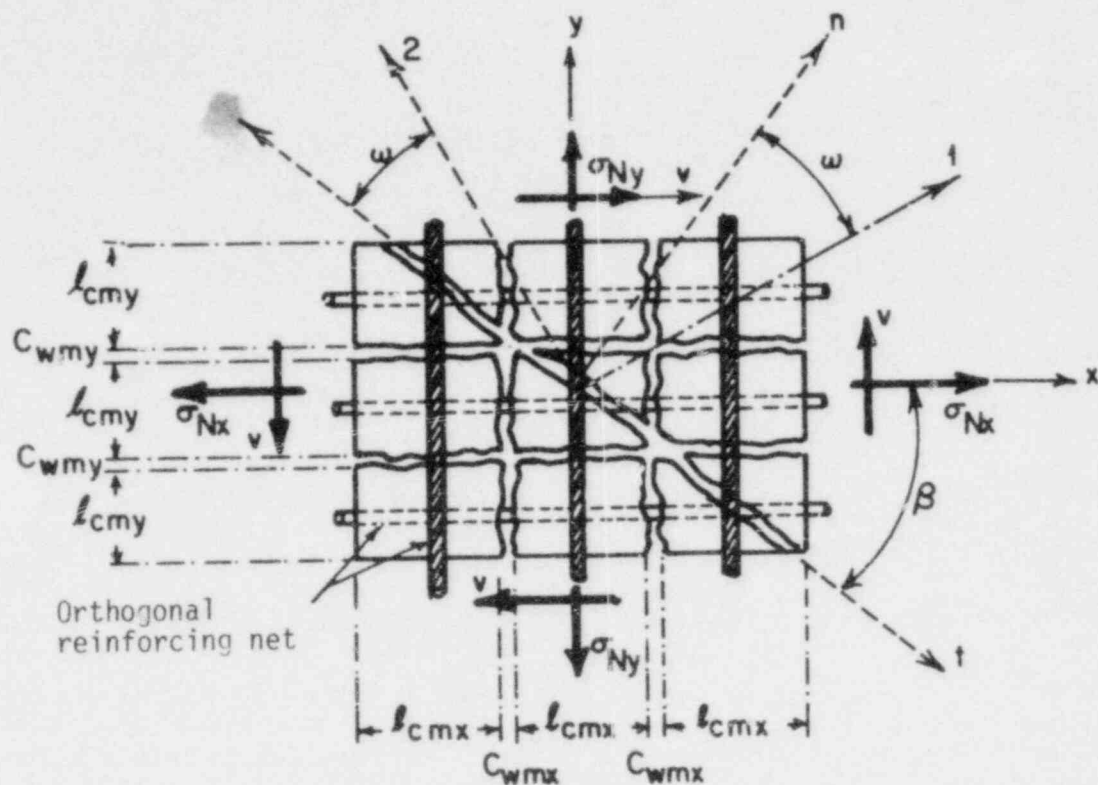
Idealized flat reinforced concrete membrane element cracked orthogonally and diagonally.
